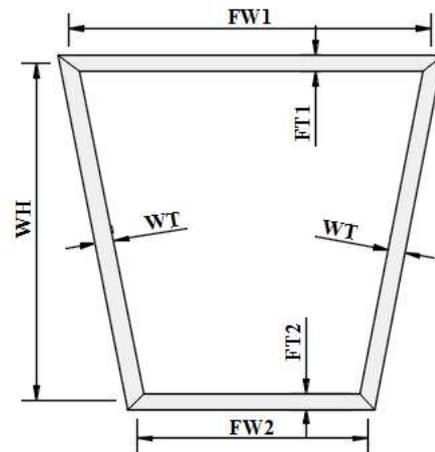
Cross section of steel trapezoidal-box girder with design parameters used in the optimizations.
